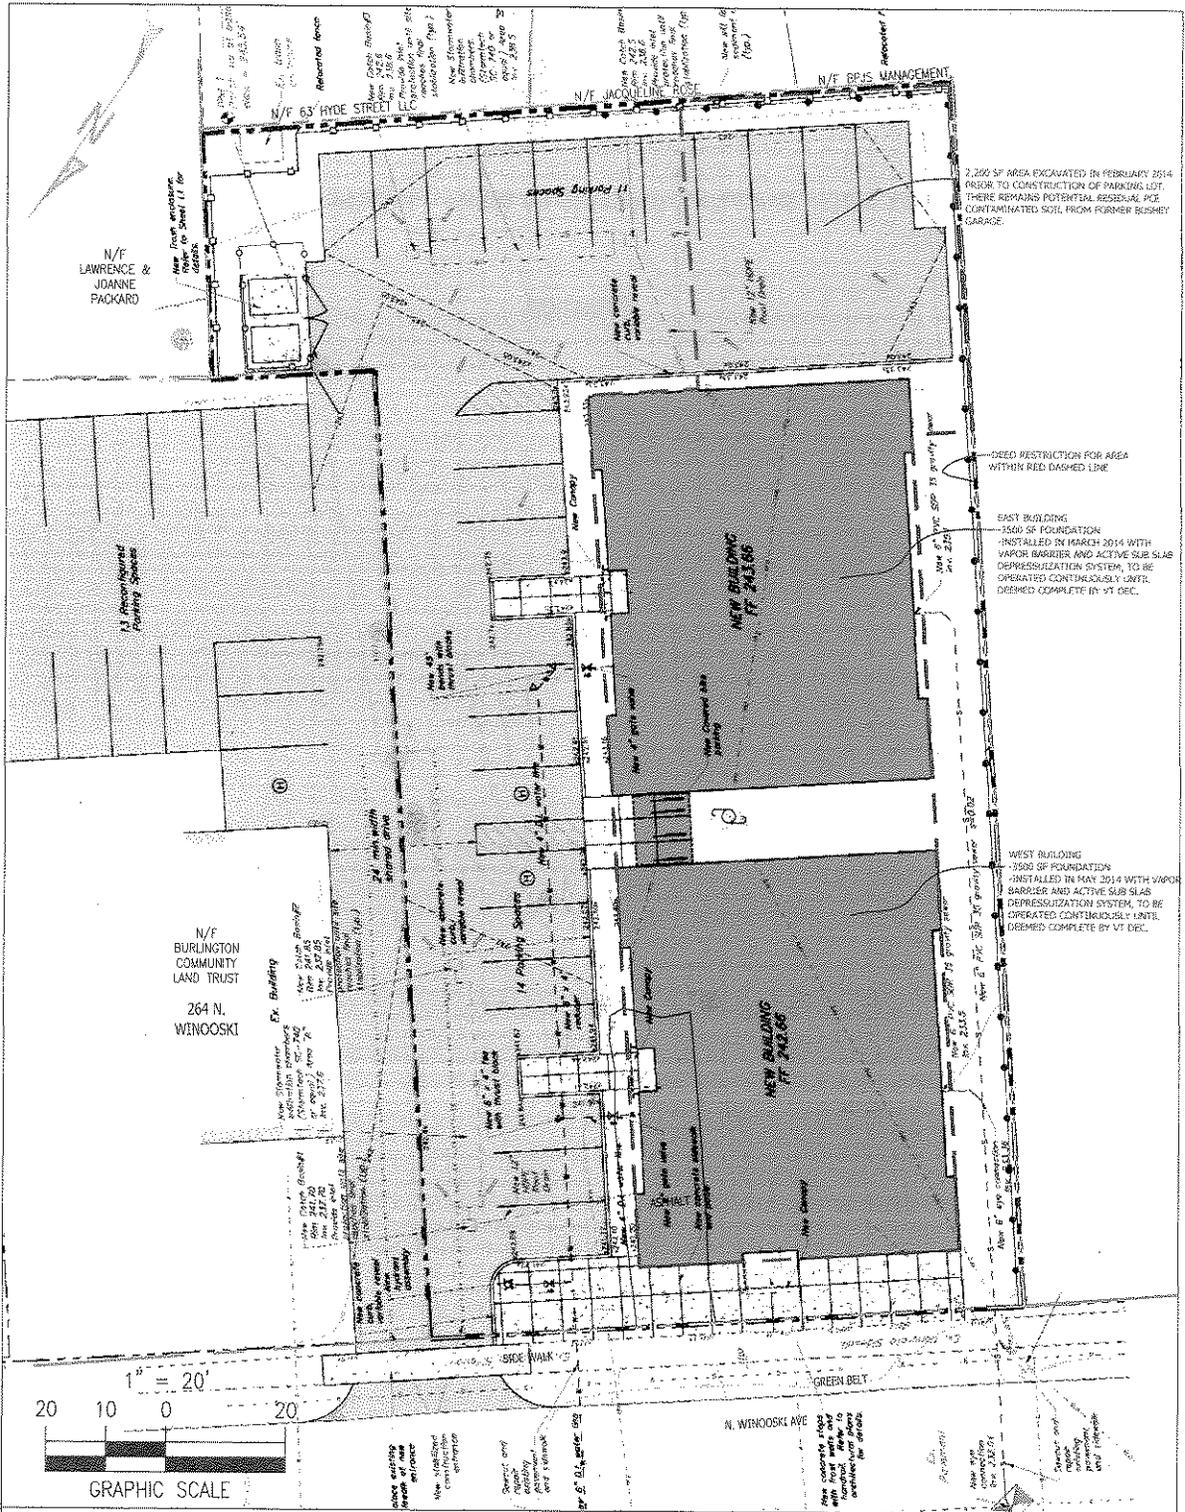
EXHIBIT: CORRECTIVE ACTION SITE PLAN
